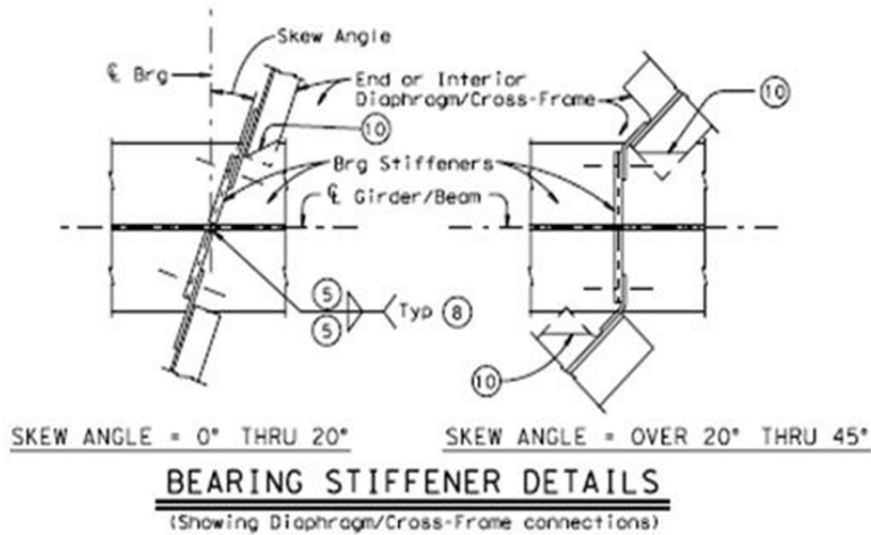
TxDOT standard skewed cross-frame connection (from SGMD sheet 1)
